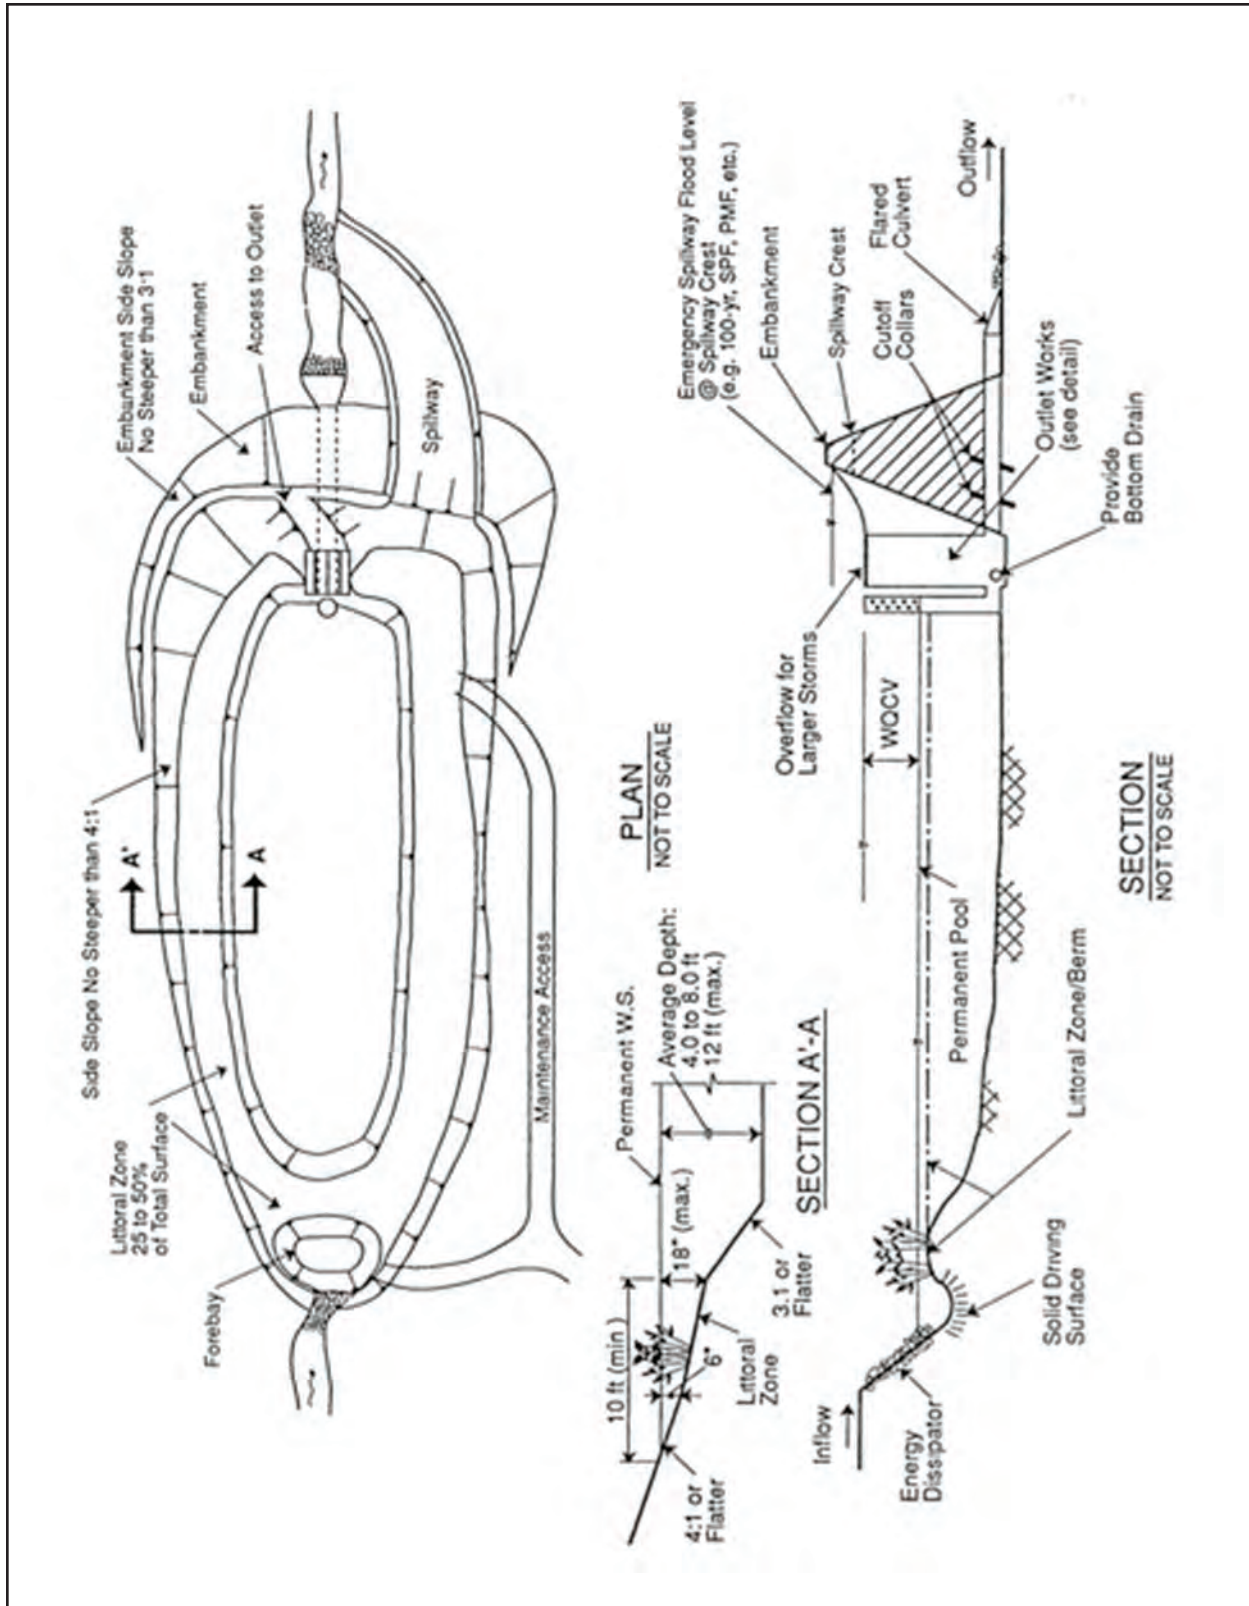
Typical Retention (Wet) Stormwater Storage
